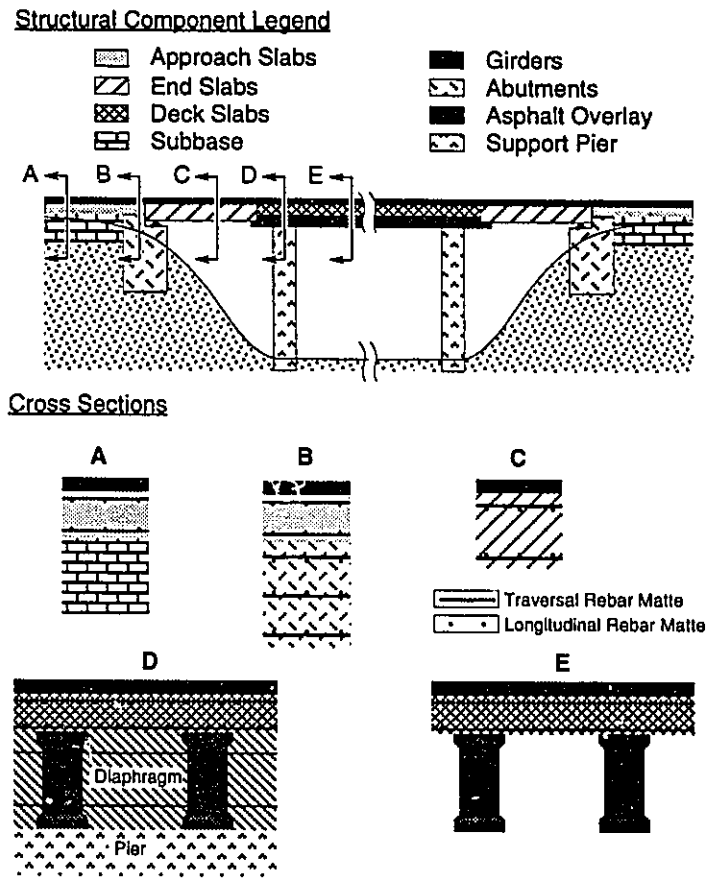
Typical Slab-On-Girder Bridge Structural Components
